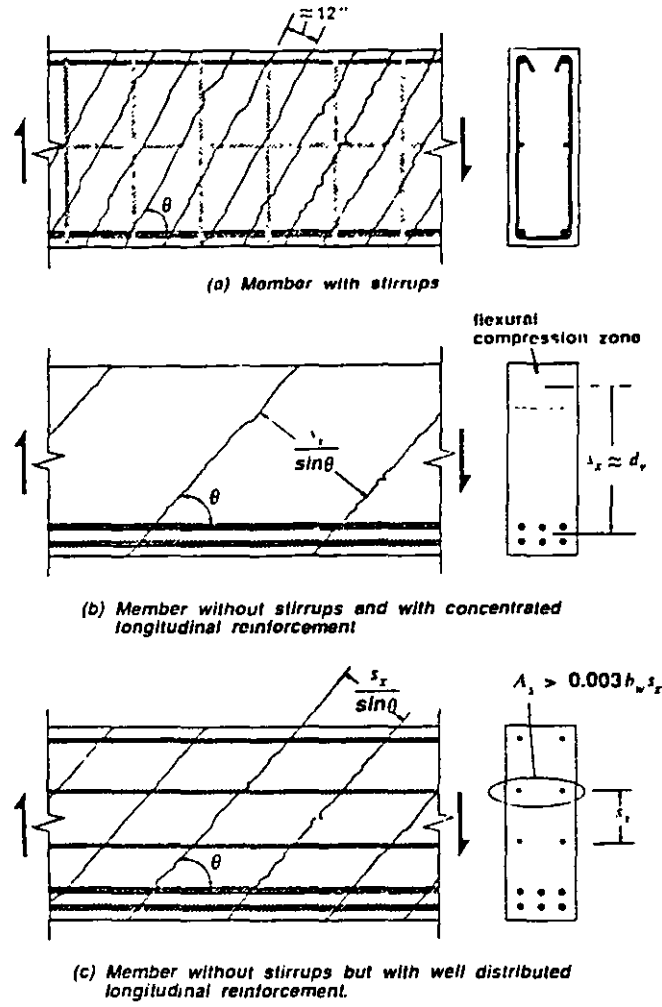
Influence of reinforcement on spacing of diagonal cracks
